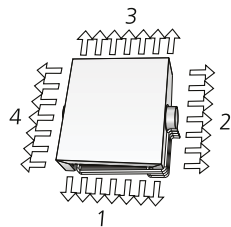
Top view of nozzle setting for a Parasol EX single-module unit, sides 1-4.
